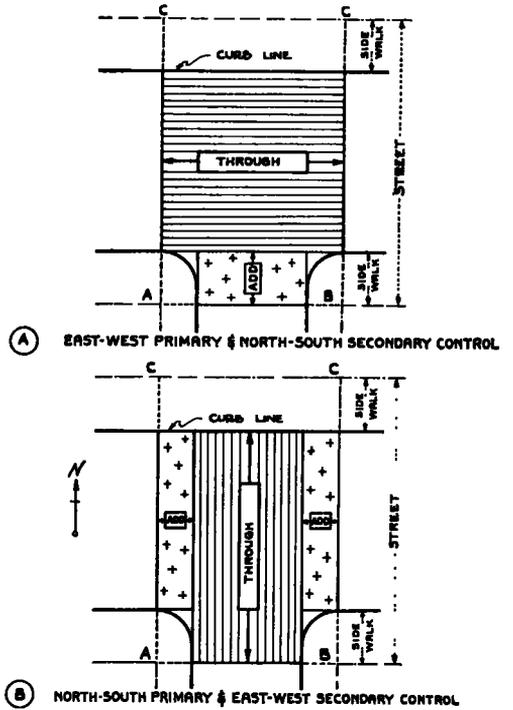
Dead End Intersection with Streets Meeting at Right Angles
